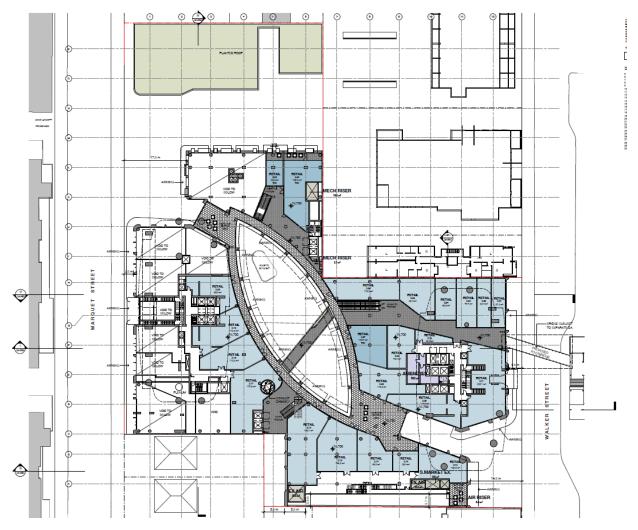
PODIUM FLOOR PLAN - GROUND FLOOR (SJB ARCHITECTS)
